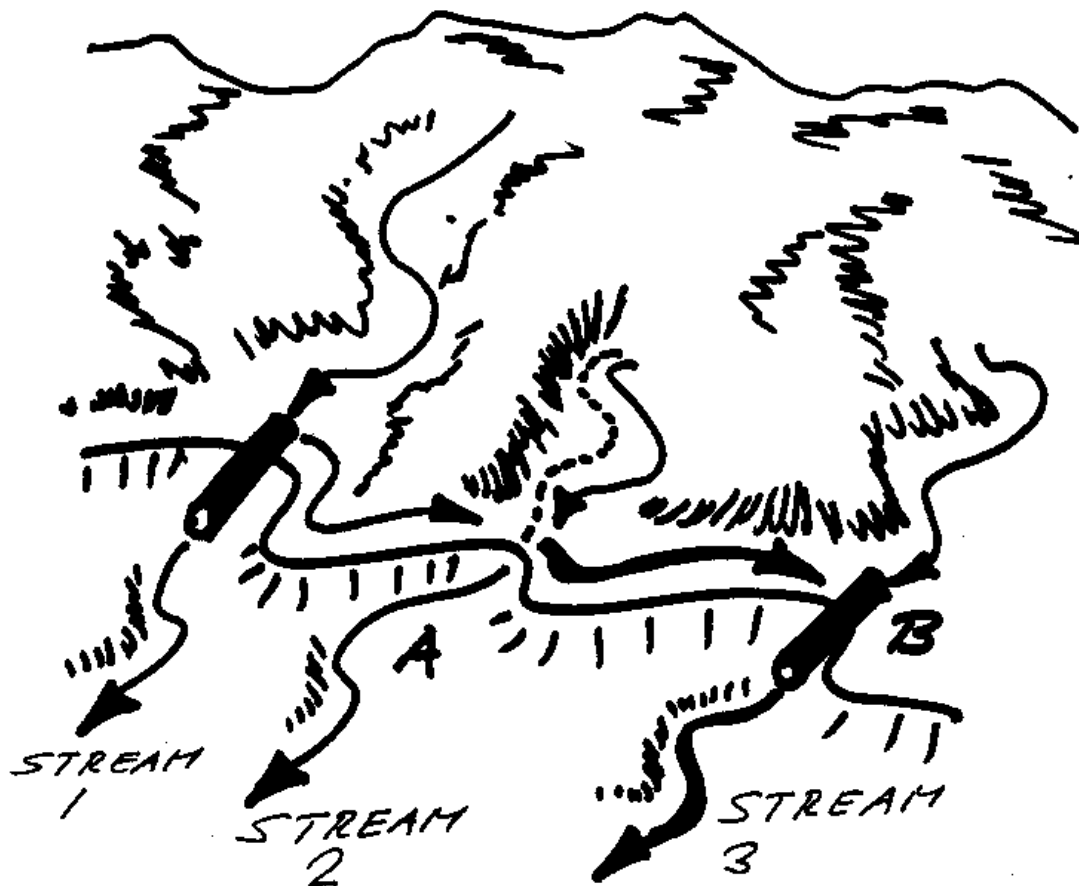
Culvert and road locations have modified drainage patterns of ephemeral streams 2 and 3. Locations A and B become potential failure sites. Stream 3 is forced to accept more water below B due to inadequate drainage at A.
